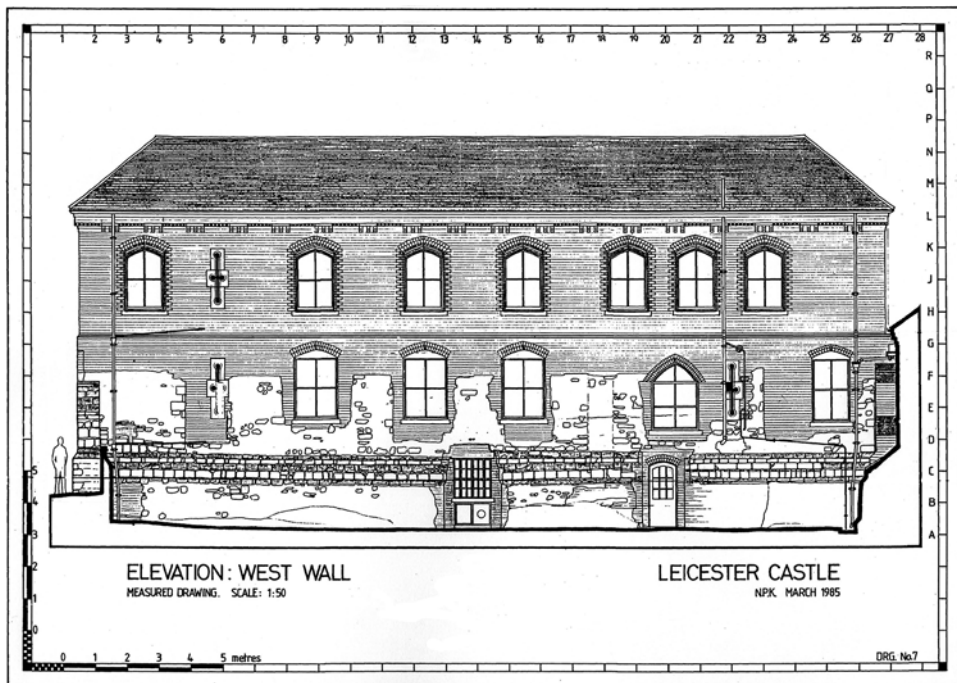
West elevation survey drawing of 1985, with surviving twelfth-century plinth and nineteenth-century top storey. *Drawing N Klee.
